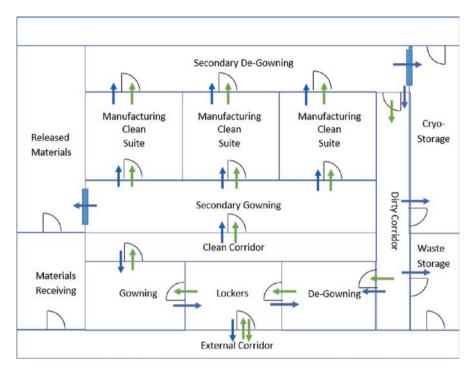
Suggested design of a high-level GMP facility floor plan (partial) The floor plan shows an arrangement of three manufacturing cleanrooms that are used by staff requiring secondary gowning. The staff directions of travel are shown by the green arrows and the relative pressure relationships by the blue arrows. The shaded blue boxes are pass-throughs
